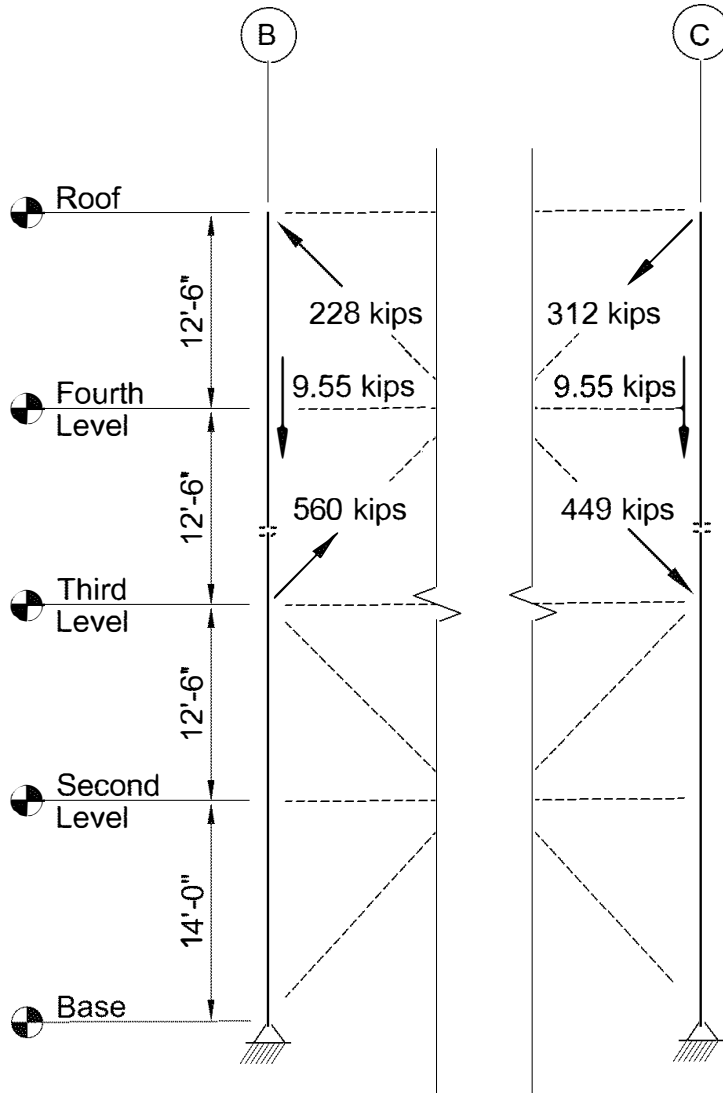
SCBF column forces for splice design from Example 5.3.3.
